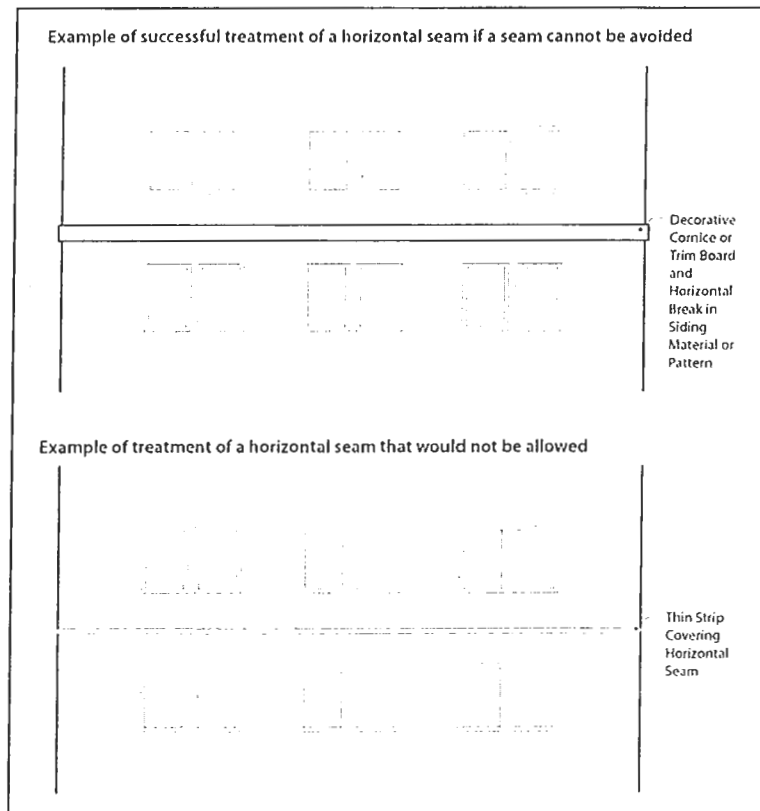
Exterior Walls – Horizontal Seam Treatment
